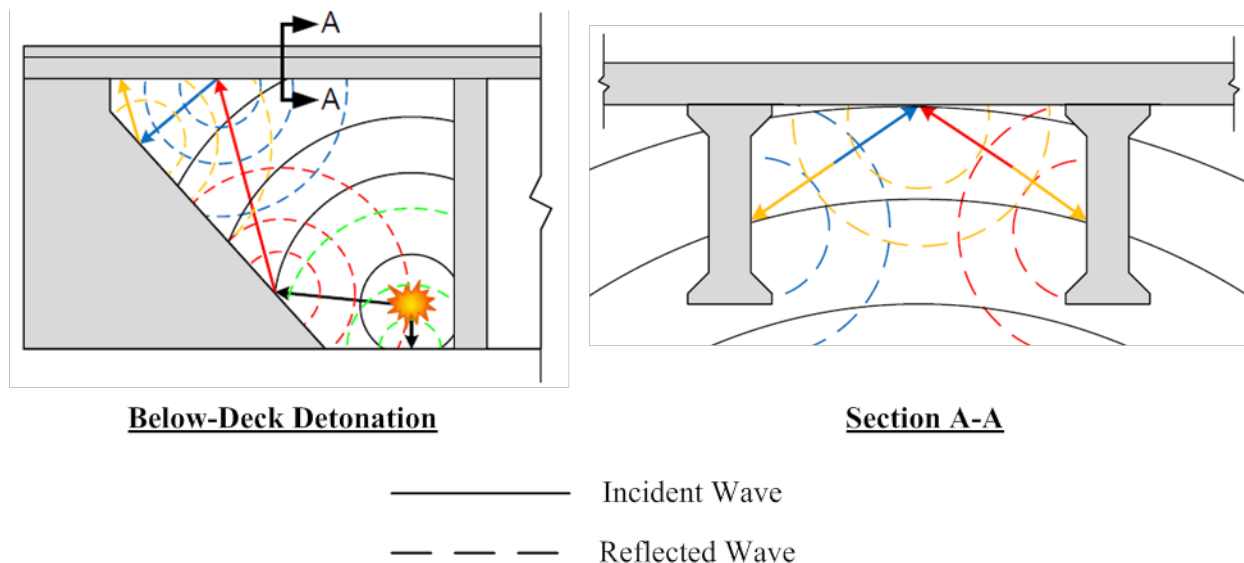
Illustration of Airblast Complexities from a Below-Deck Detonation [21]
